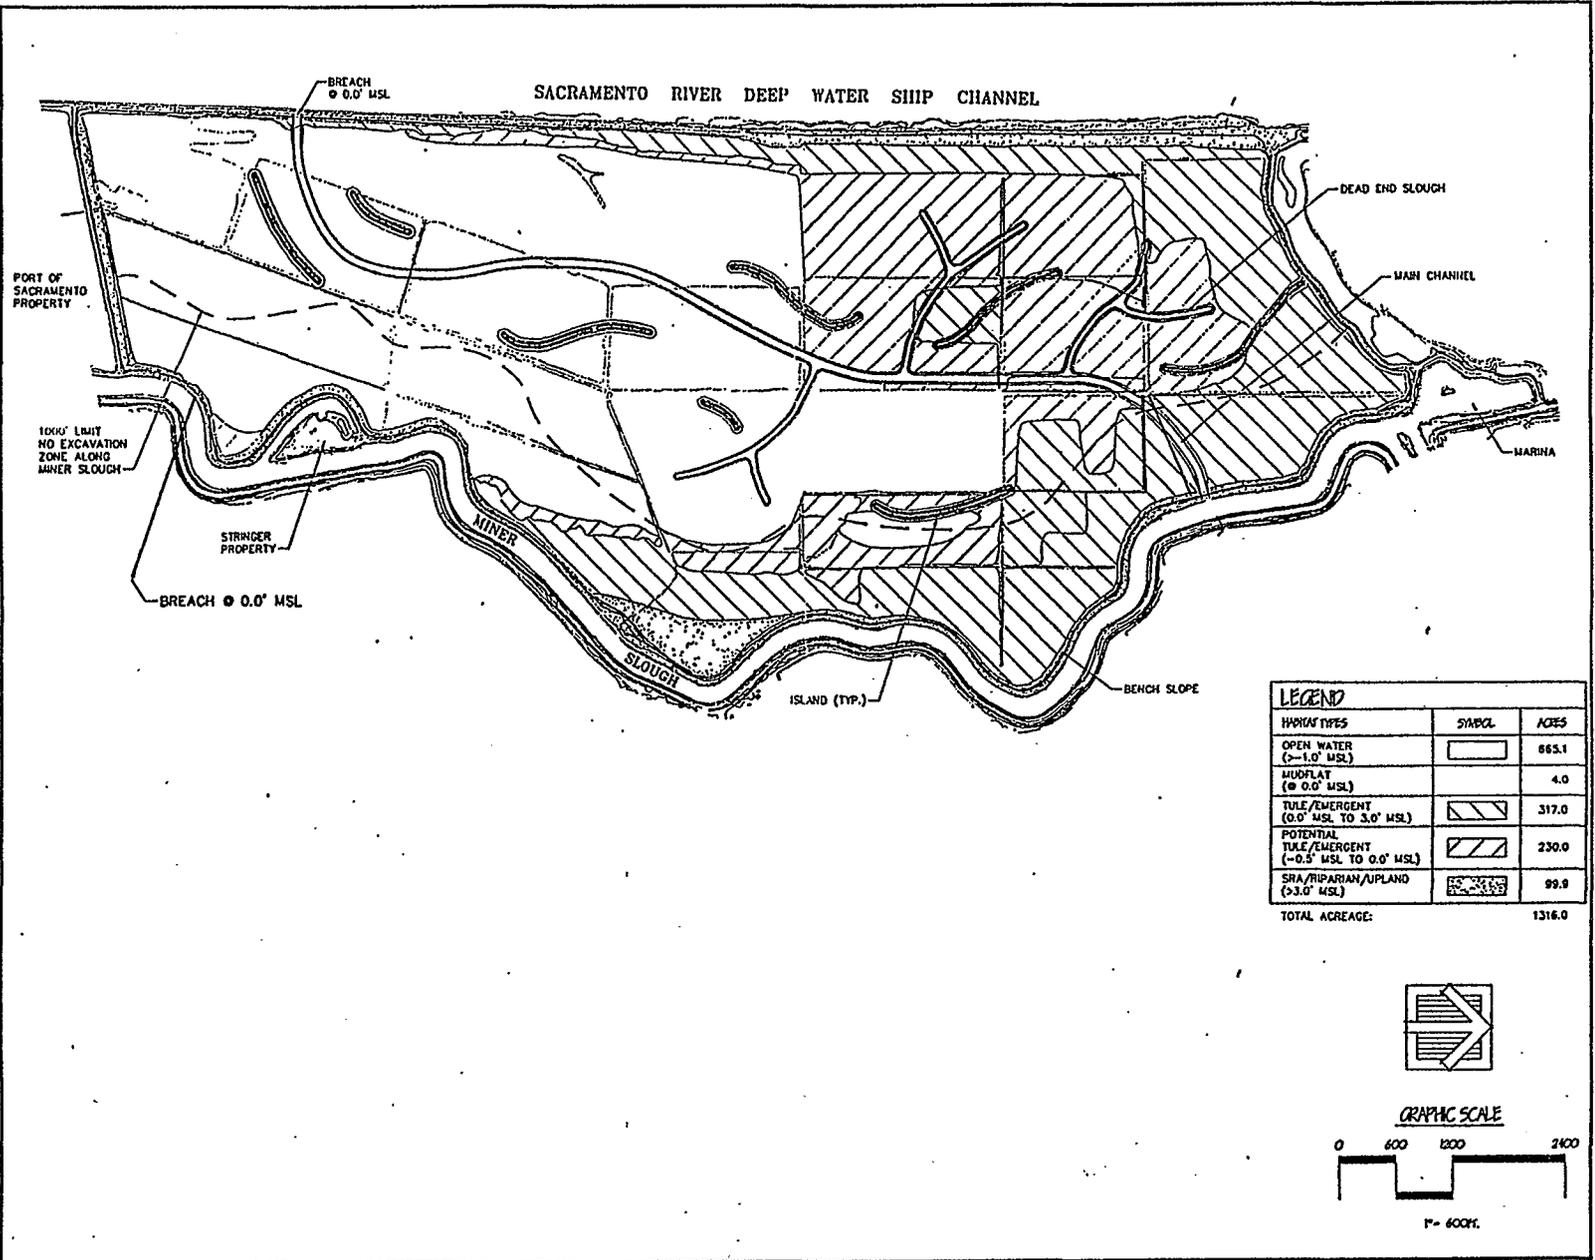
General layout of earthwork for the Prospect Island Restoration Project. Levee benches (not shown) will be 10 to 40 feet wide. Island positions and dimensions are subject to minor revisions.
